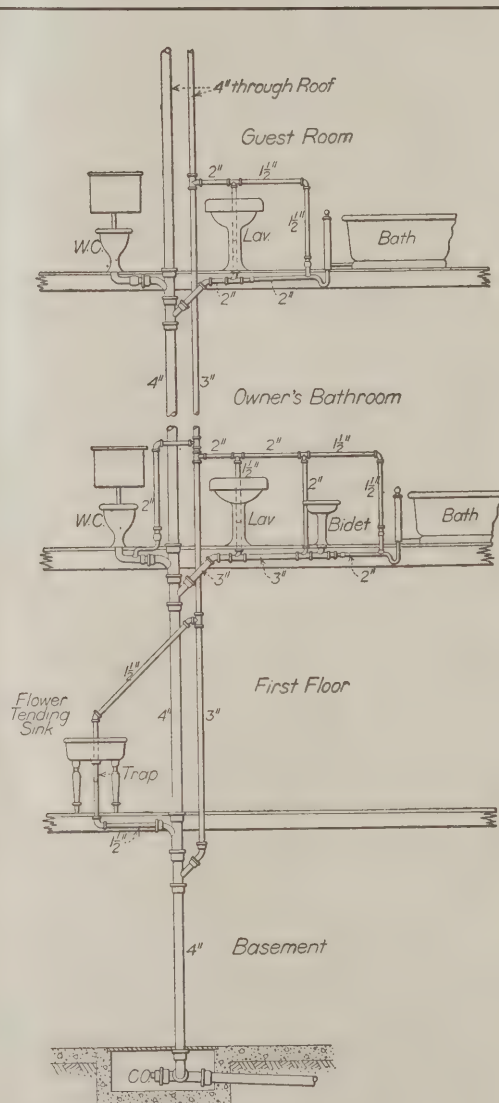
Elevation of Stack No. 1 with Connections from Fixtures on Various Floors
